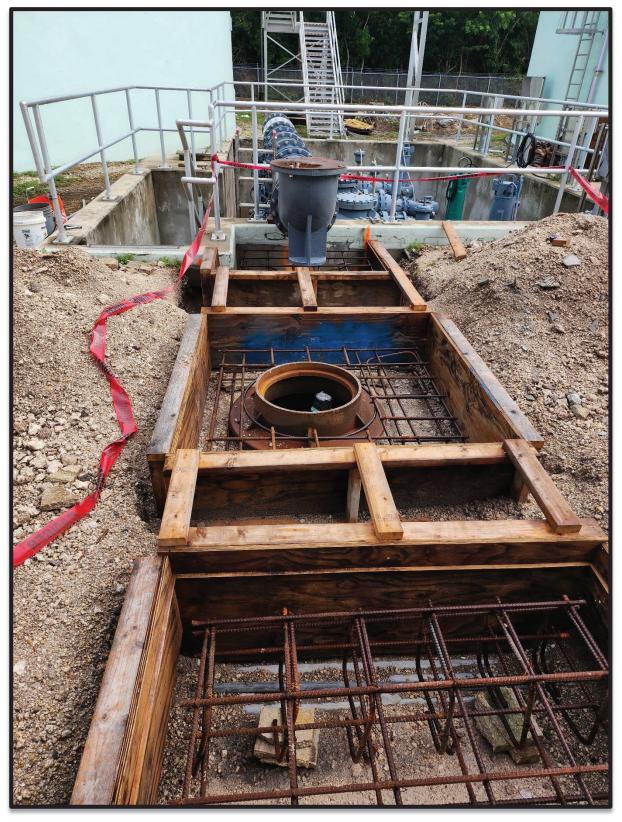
Concrete Forms Installed with Structural Rebar Between Disk Filter Platform and Booster Pumps Basin
